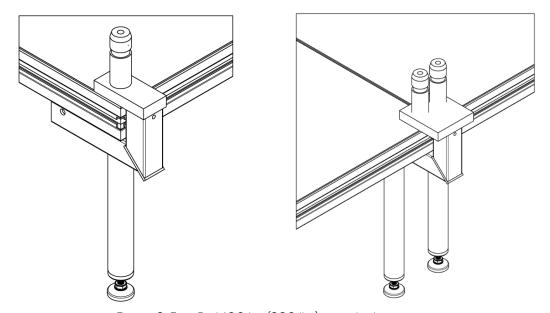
EasyRail 100 kg (220 lbs) guardrail spigot
